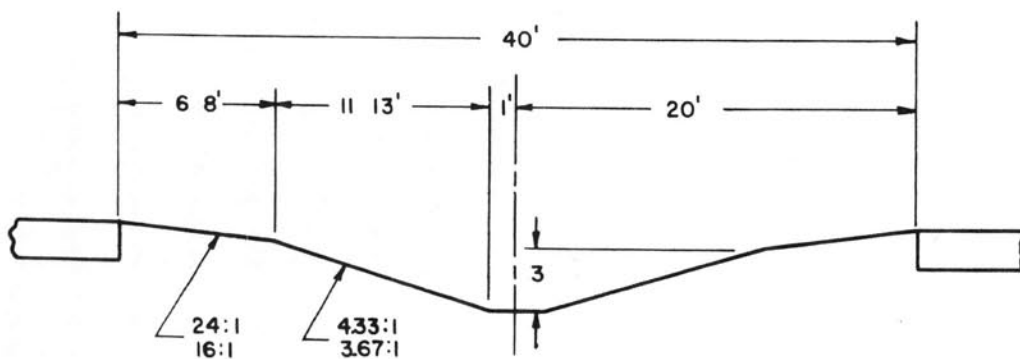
TYPICAL MEDIAN CROSS SECTION FOR U.S. ROUTE 66
